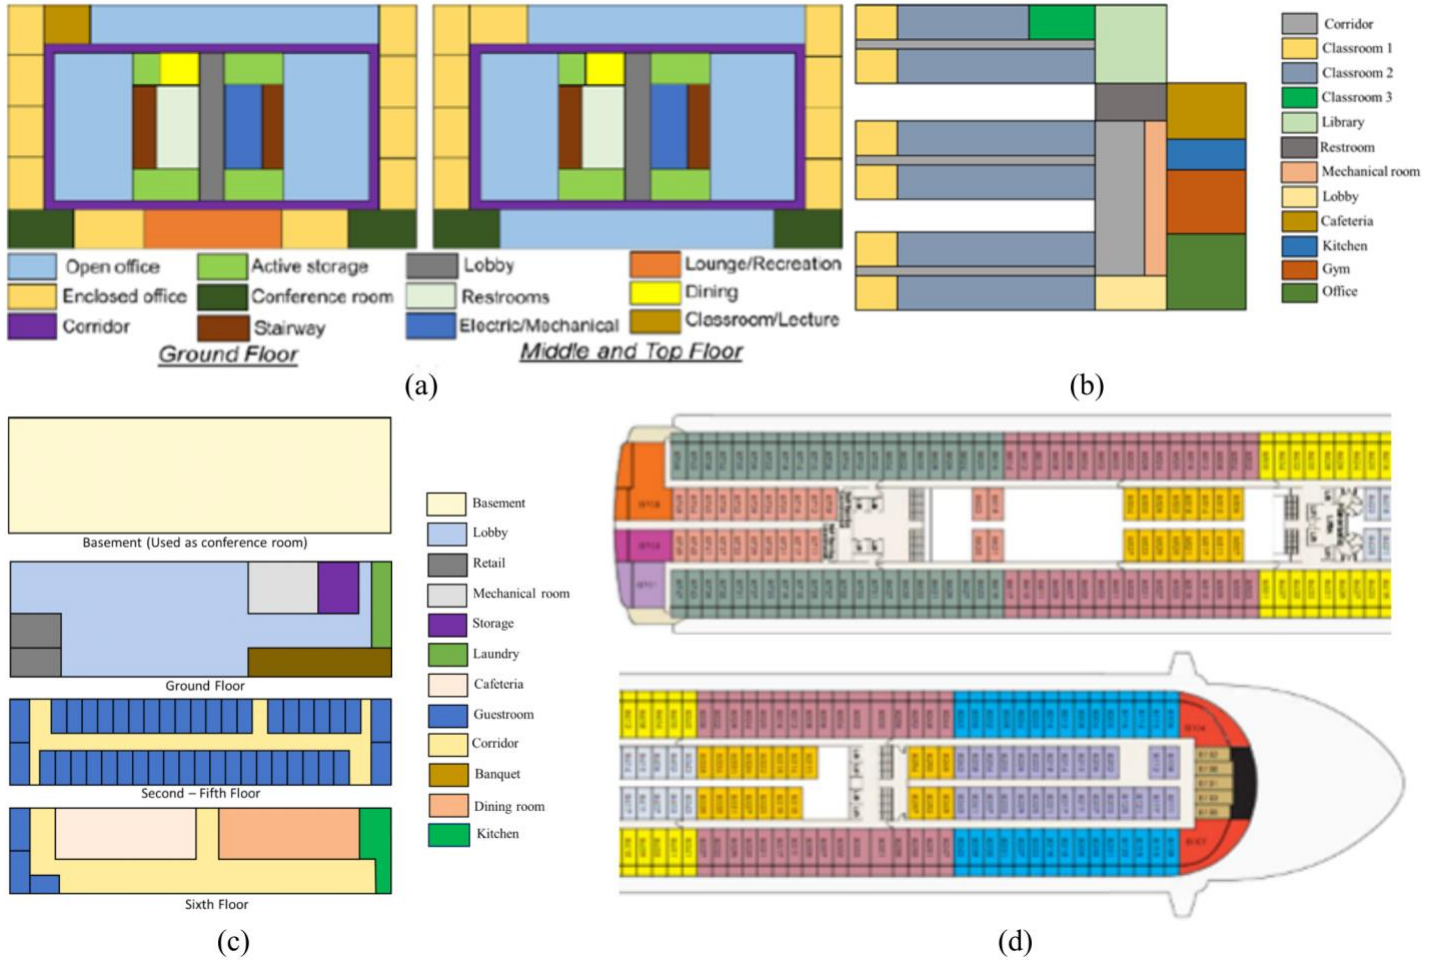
Floor plan of four space types: (a) mid-size office building [52], (b) school [53], (c) hotel [53], and (d) cruise ship [54].
